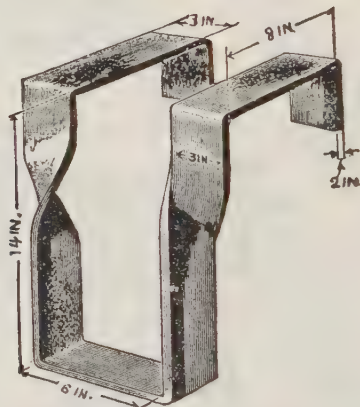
,838.—Builder's stirrup or joist hanger. *It consists of an iron or steel strap so constructed that it hangs over the trimmer or header and forms a footing for the header or tail beams, being much stronger than mortise and tenon, or spiked joints, as no wood is cut away, or nails depended upon to carry the load.
